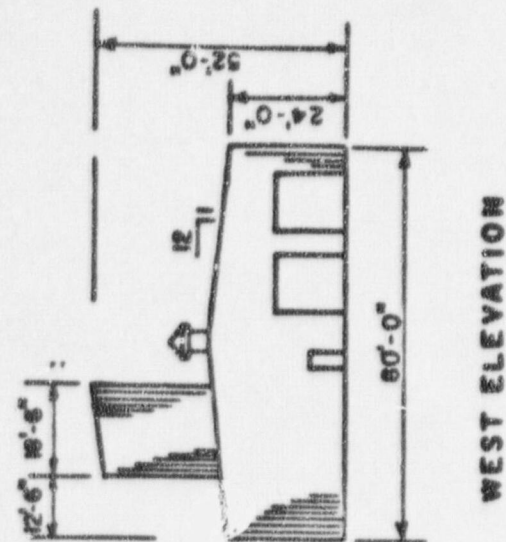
EXTERIOR PLANS of 600 GPM PLANT
